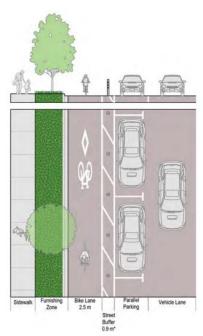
Uni-Directional Parking Protected Bike Lane (<u>p. D35</u>, BC AT Design Guide).
